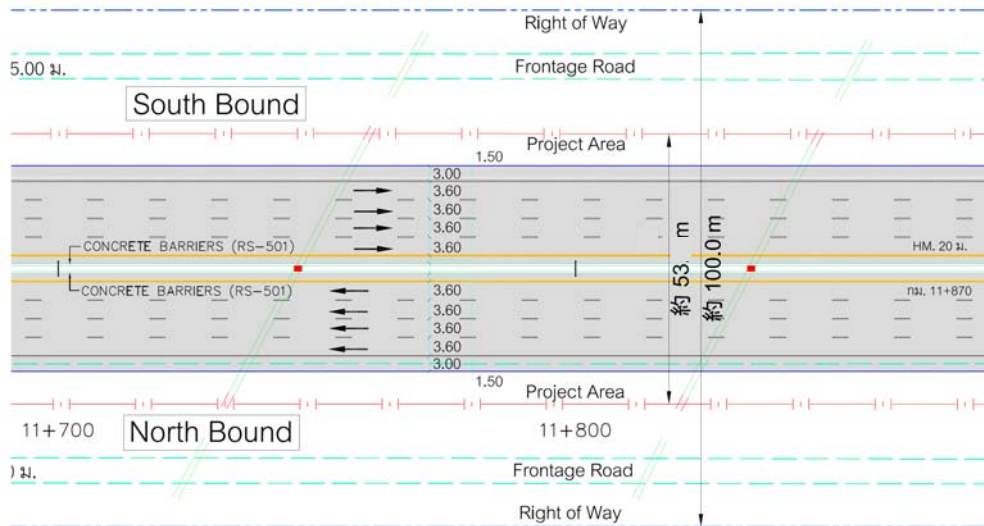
Right of Way of the Objective Road (Outer Bangkok Ring Road)
